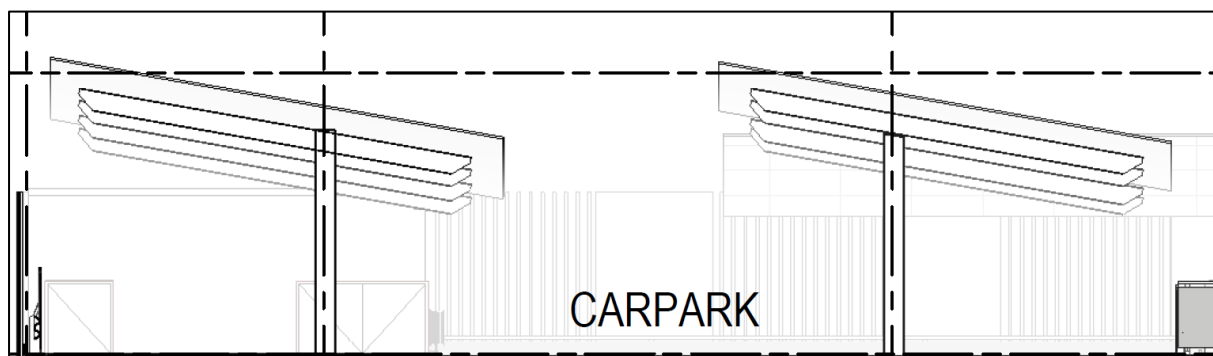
| Proposed rooftop solar arrays (Source: Modification Report)
